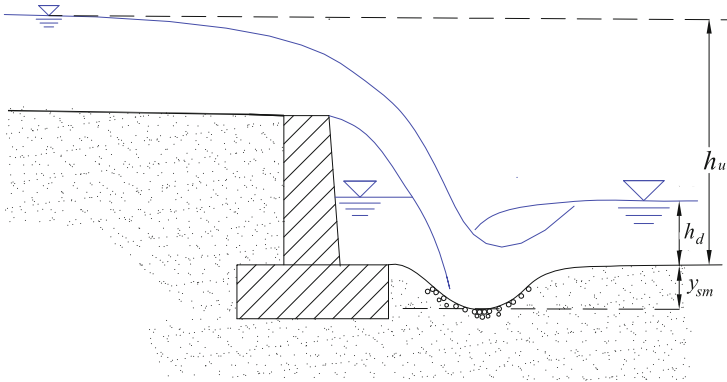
Layout of the erosion downstream of a drop or a check dam
